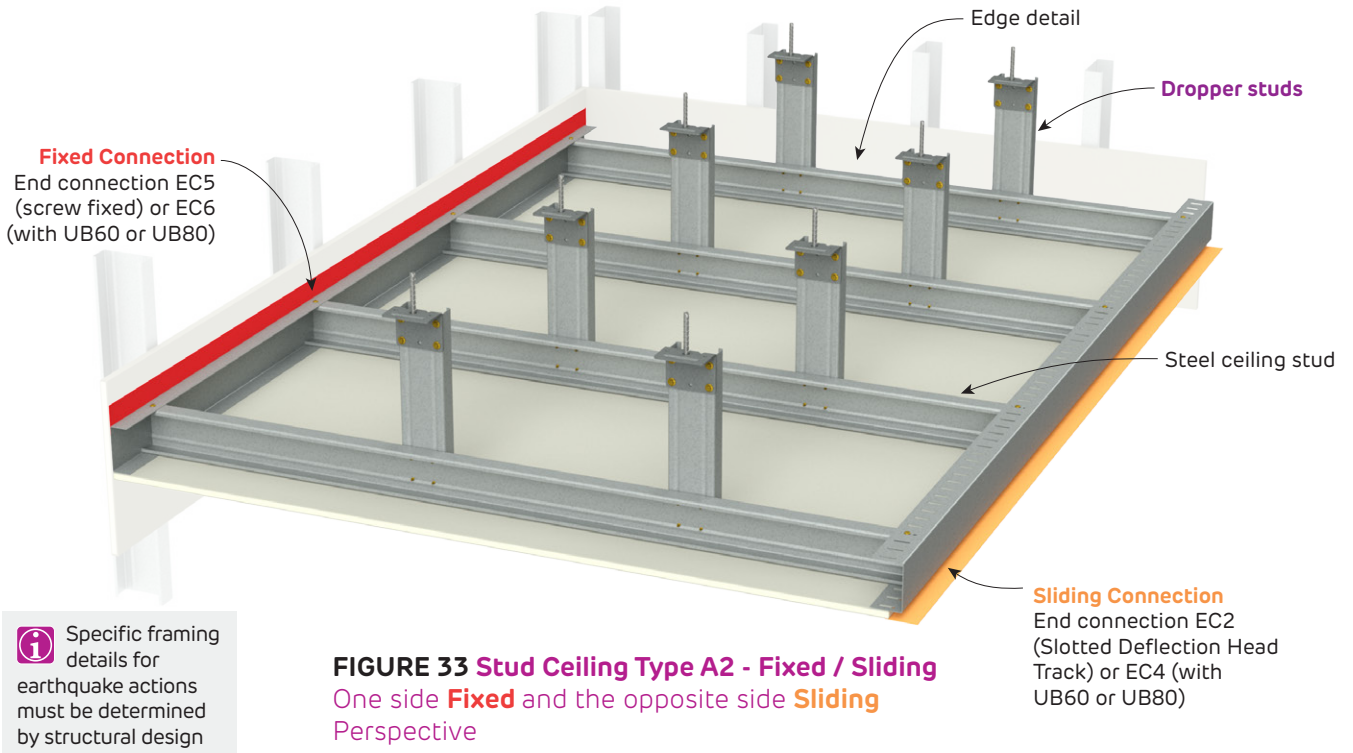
Stud Ceiling Type A2 - Fixed / Sliding
